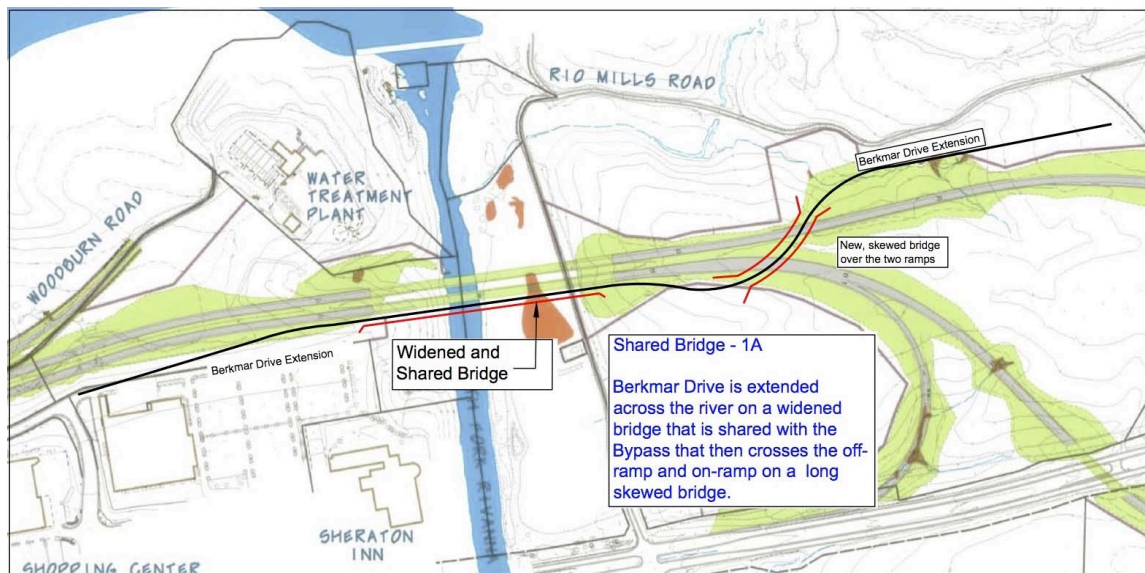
A. Shared bridge and one long, skewed bridge over the Bypass ramps
